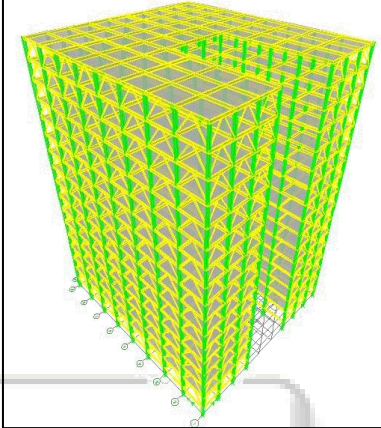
3D model of G+ 16 storey building with Inverted V bracing
